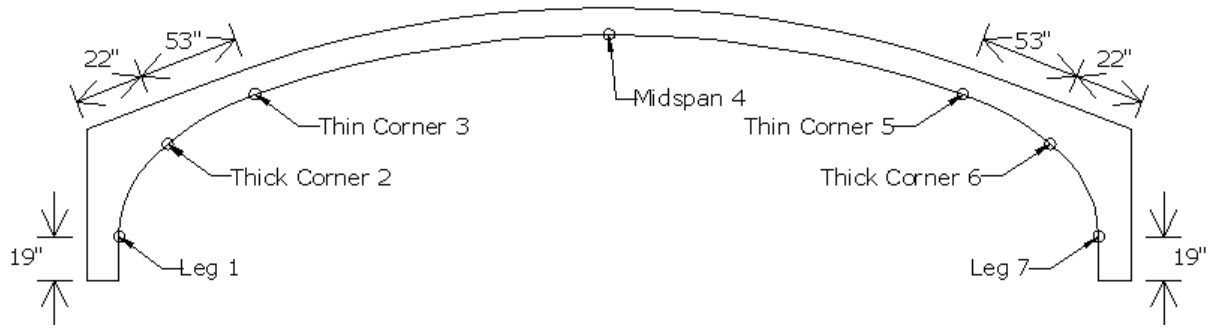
Gauge Layout – 36 ft Clear Span Test Specimen
